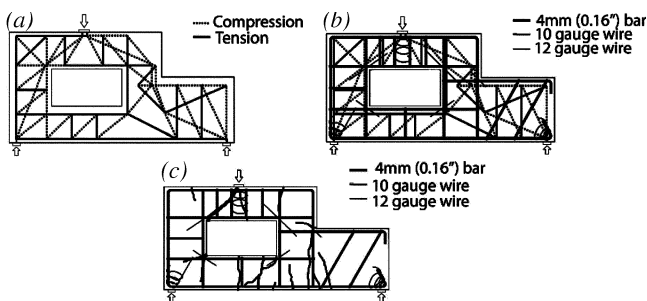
Specimen 5: (a) STM; (b) reinforcing layout superimposed on STM; and (c) crack pattern at failure superimposed on reinforcing layout.
